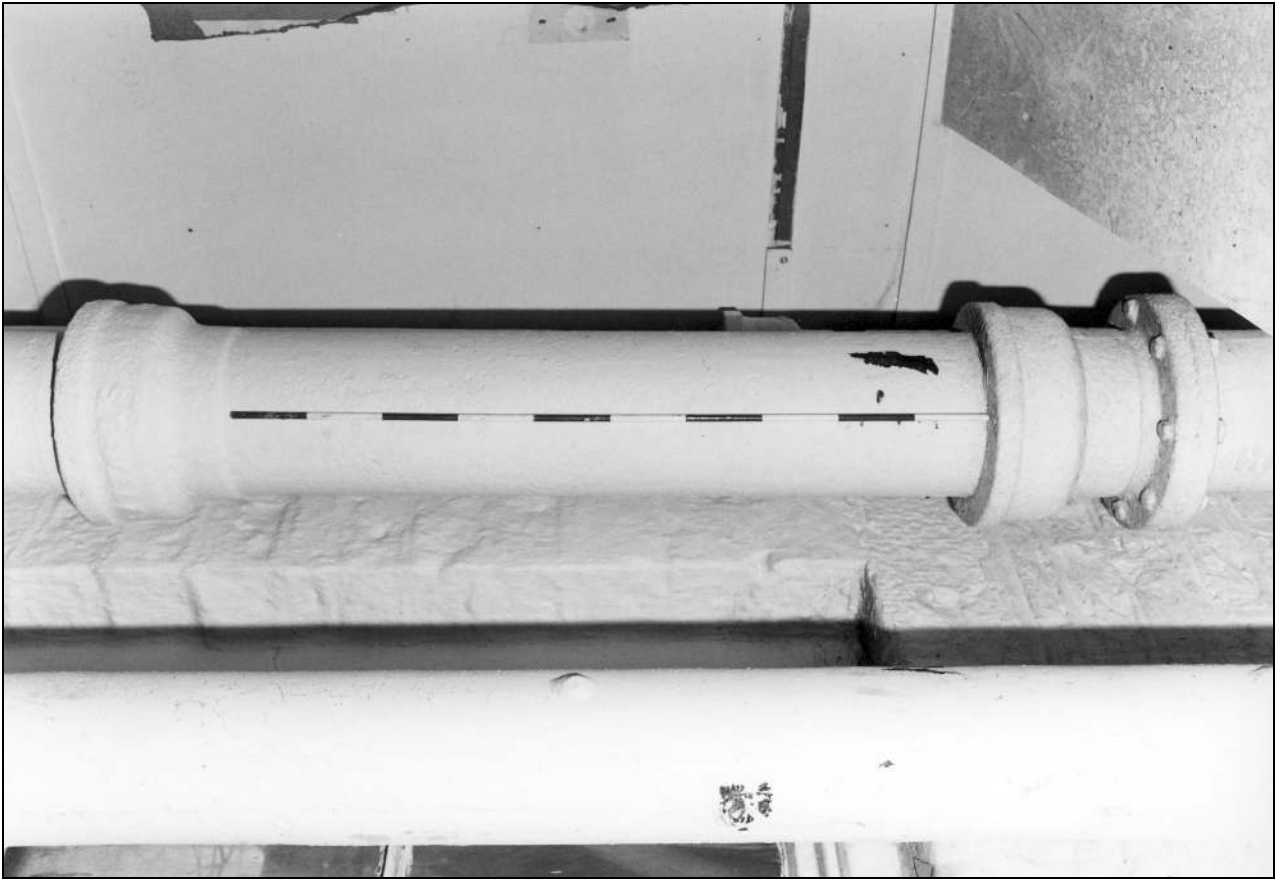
Bay 4: detail of overflow pipe (no 1) (film 3, frame 10)
